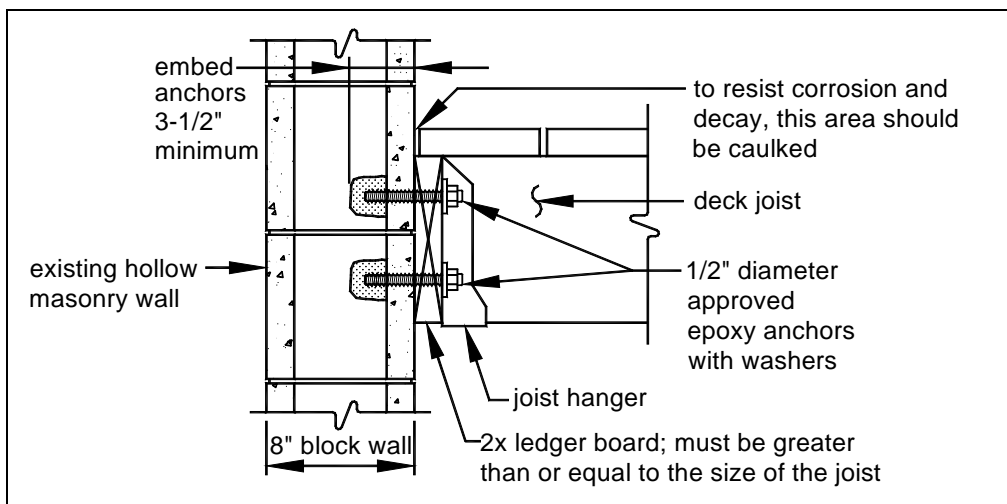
ATTACHMENT OF LEDGER BOARD-TO-FOUNDATION WALL (HOLLOW MASONRY)
